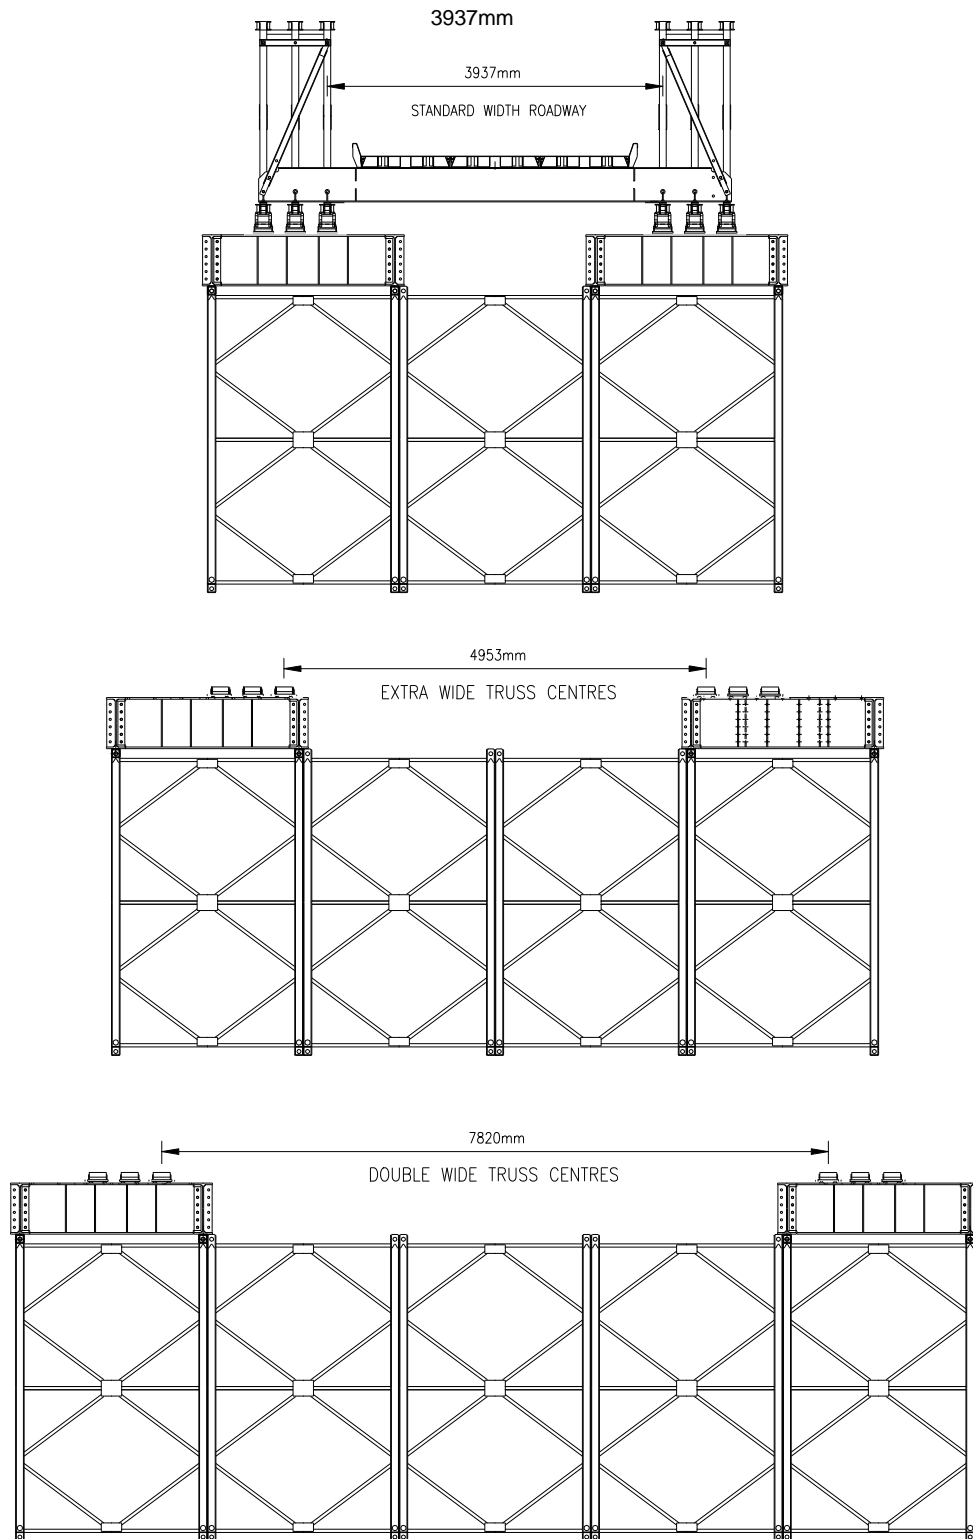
PIER LAYOUTS FOR VARIOUS ROADWAY WIDTHS
